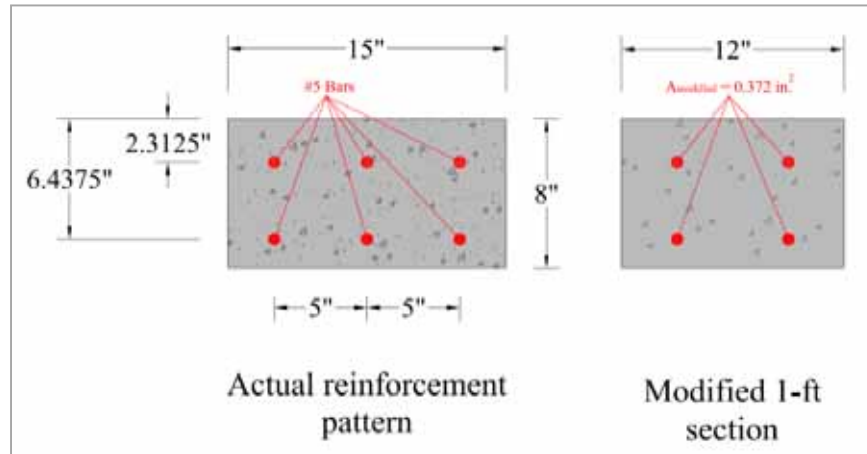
Actual and modified 1-ft wide section of the concrete deck in the transverse direction
